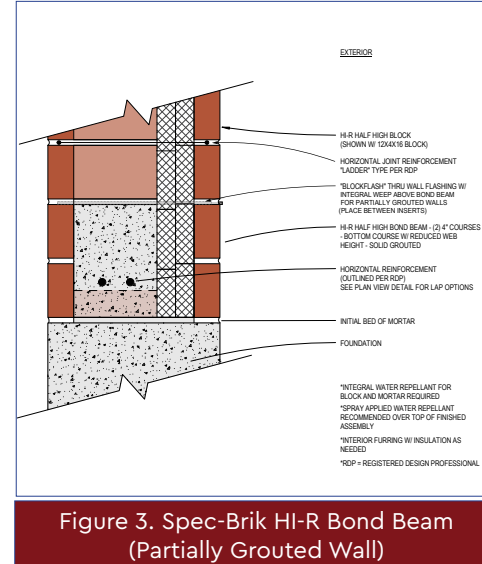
Spec-Brik HI-R Bond Beam (Partially Grouted Wall)
